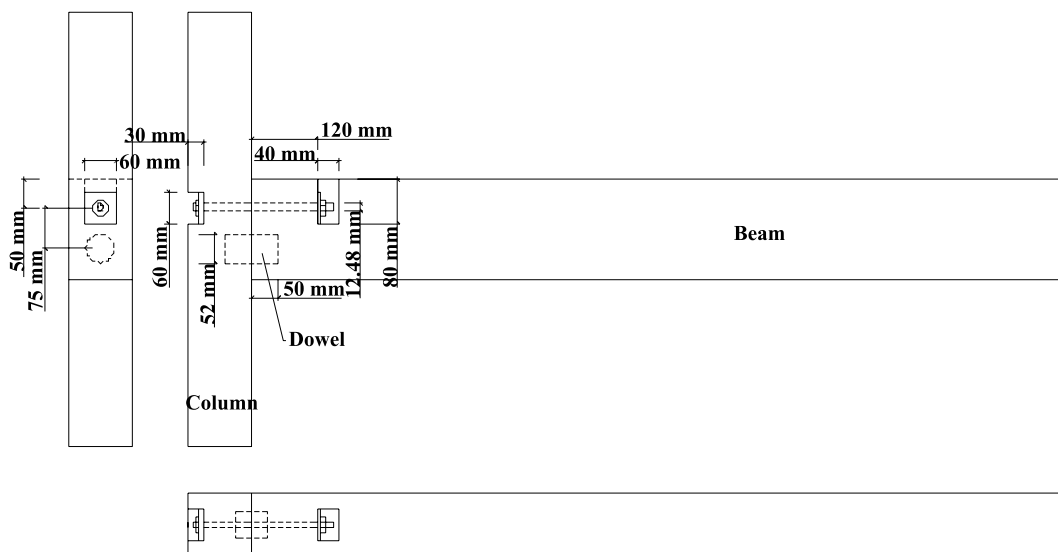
Beam and column joint configuration with 1 threaded rod at the top location.
